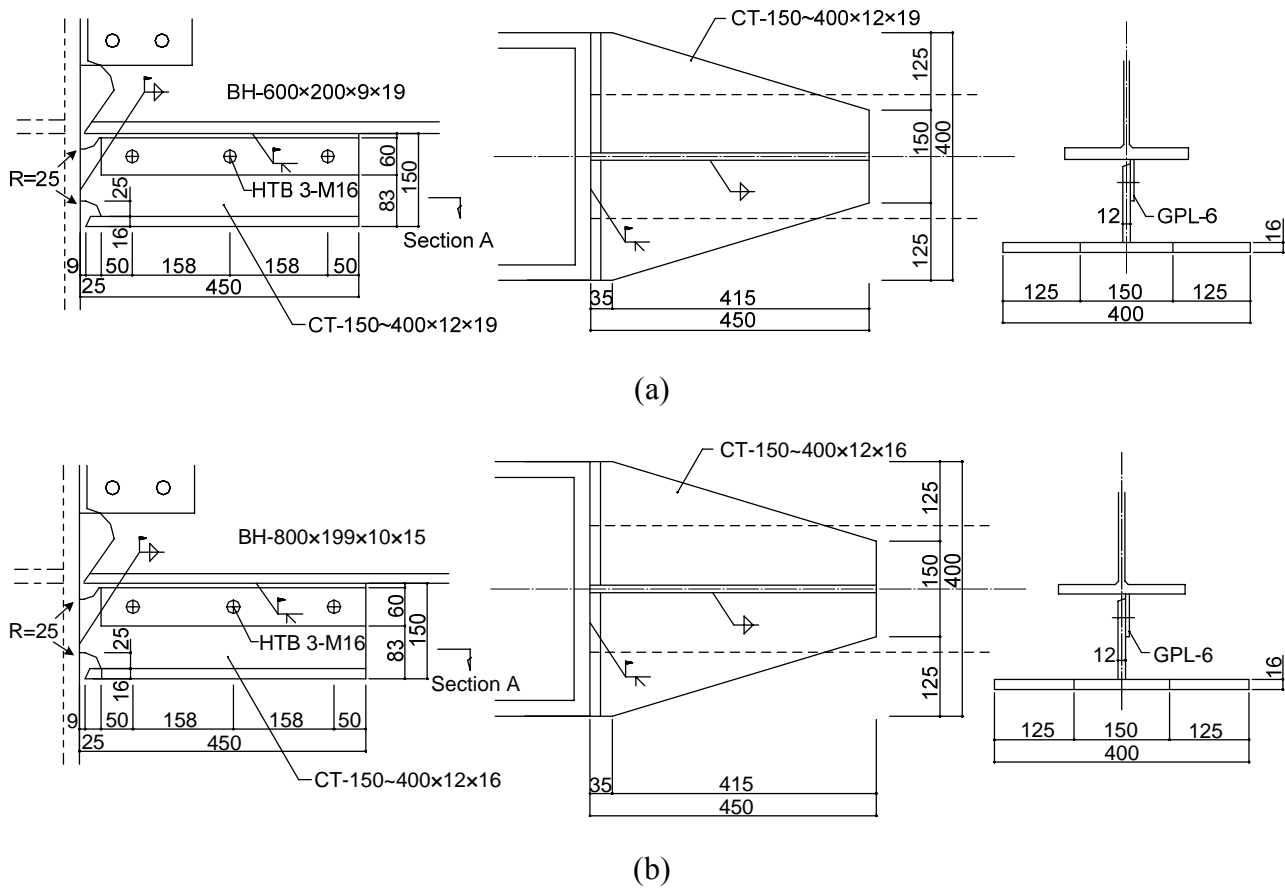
Details of the straight haunch connection: (a) 600 mm depth beam; (b) 800 mm depth beam
